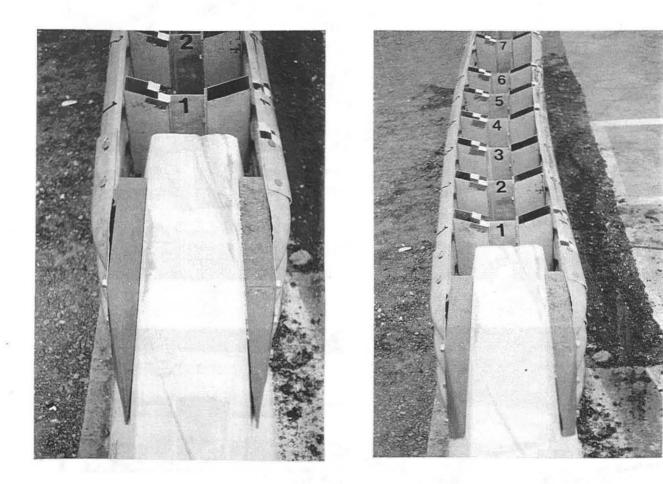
Single Slope Connector Plate Damage, Test MTSS-2
